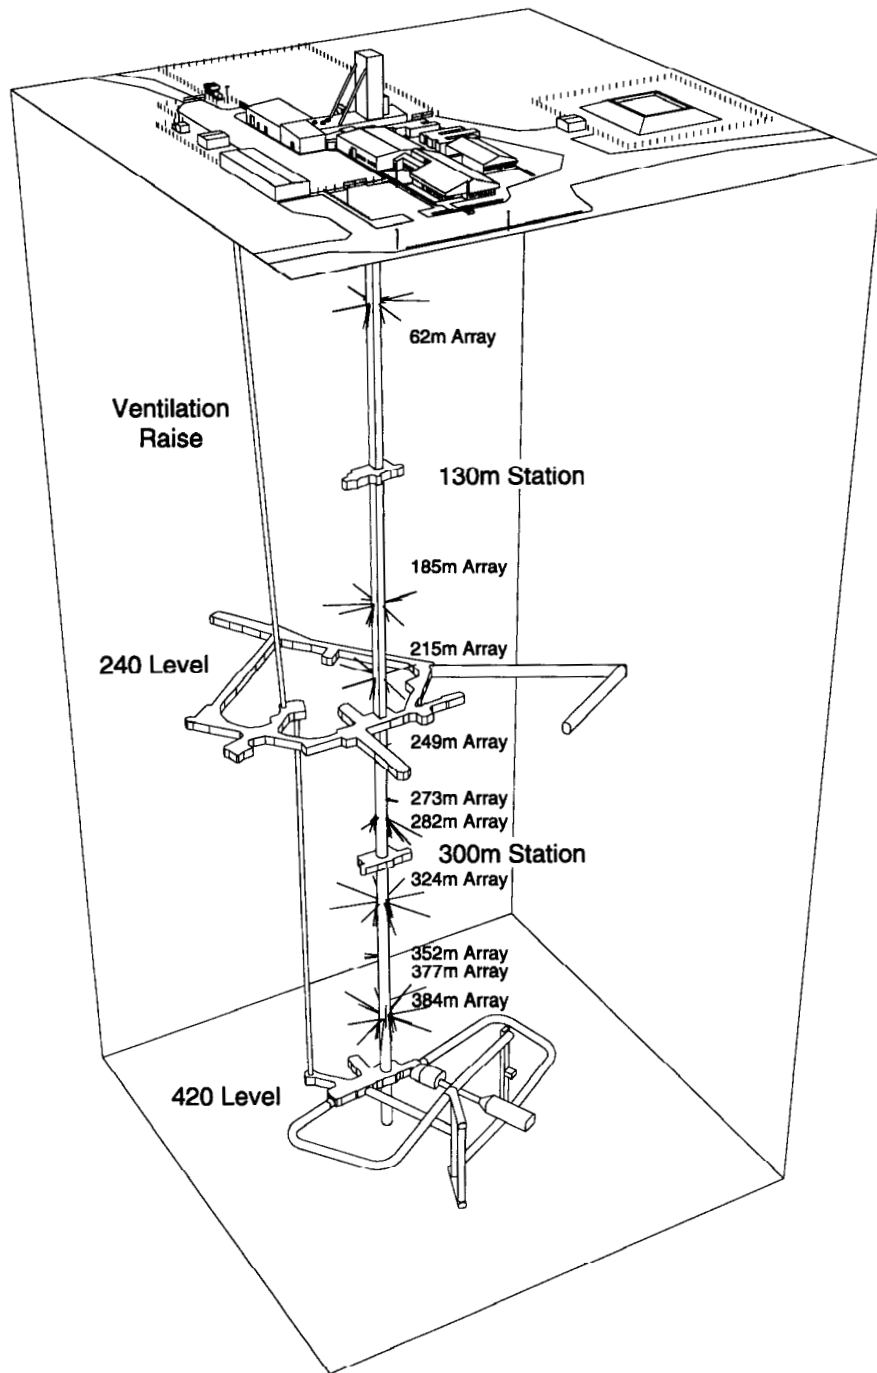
Instrument Arrays Used During the Underground Research Laboratory Shaft Construction
